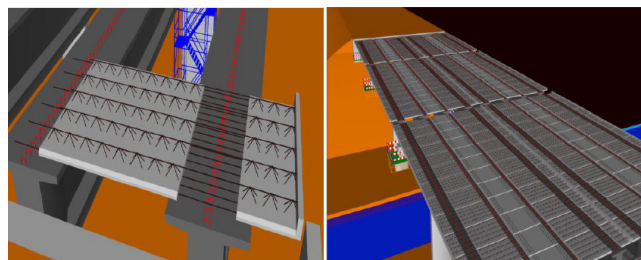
Placement of pre-slabs and concrete transversal beam and slab.
